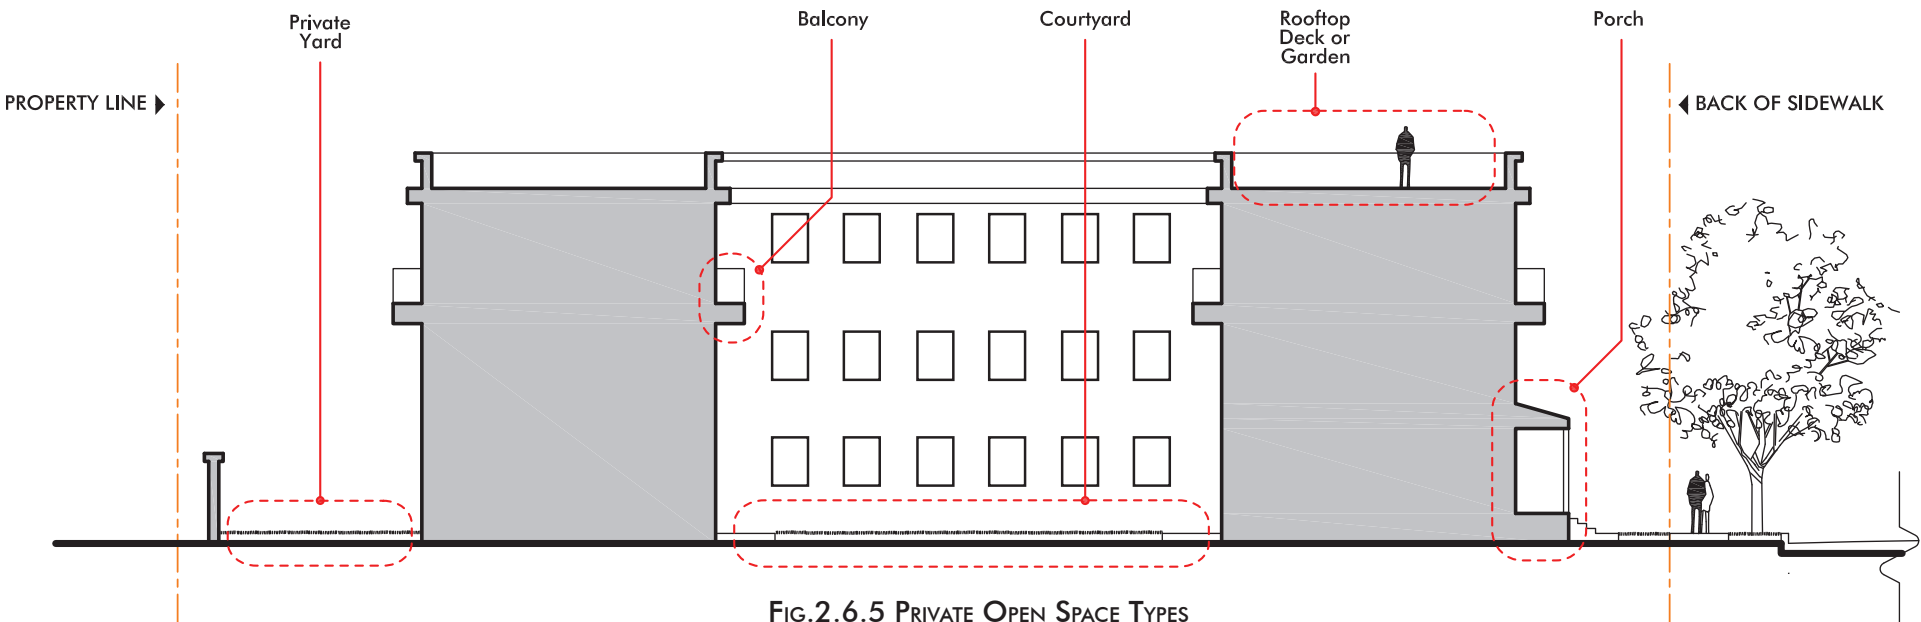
PRIVATE OPEN SPACE TYPES
